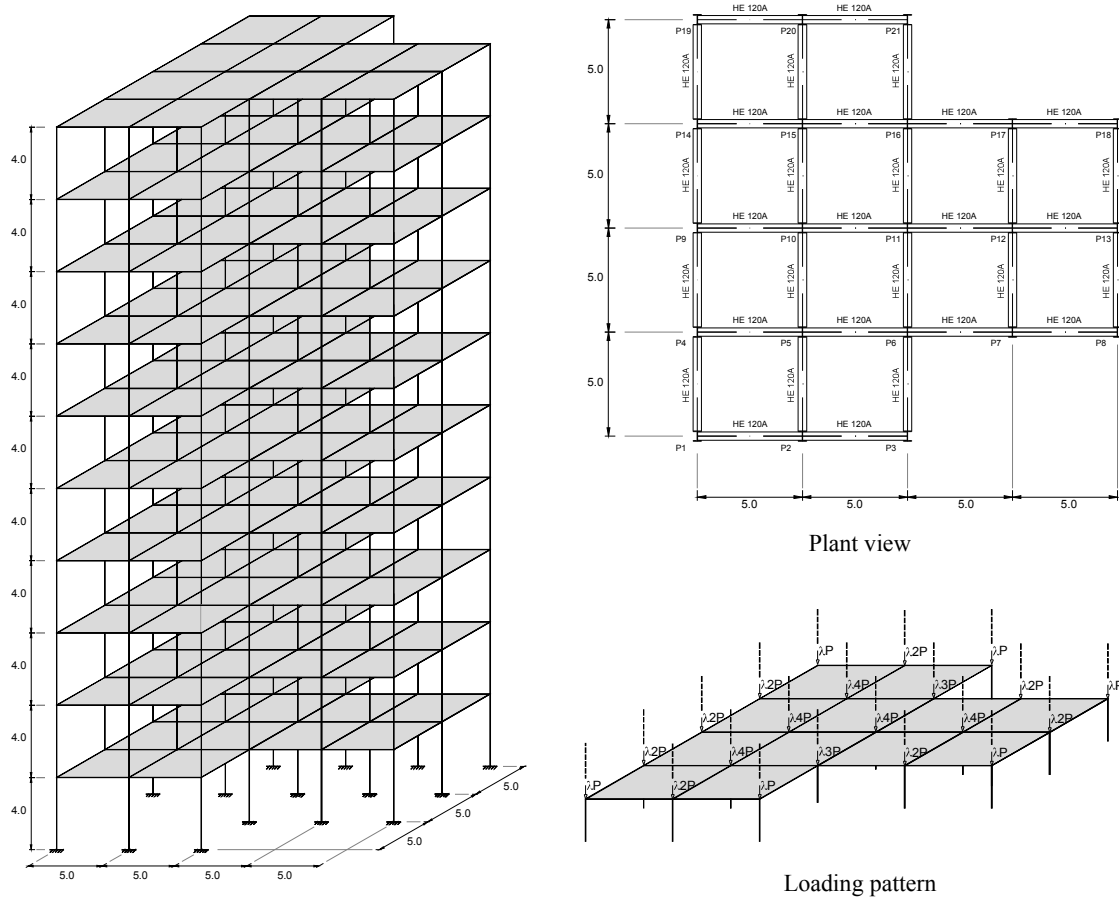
Perspective and plan view of 3D building frame and loading pattern
